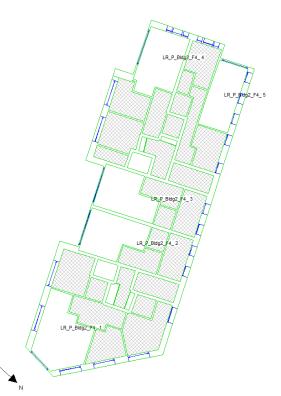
Level 4 living rooms in Building 2 (larger plan in Appendix A)
